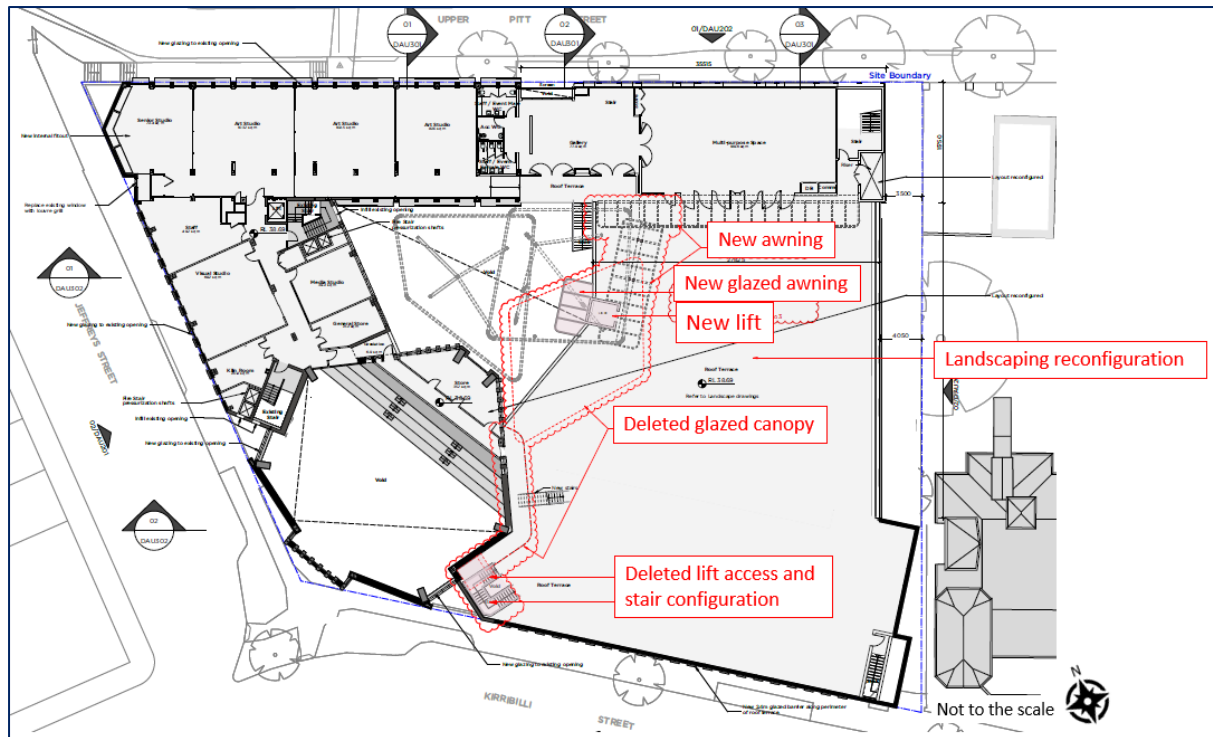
| Third floor modification (Source: Applicant's additional information 2023)
